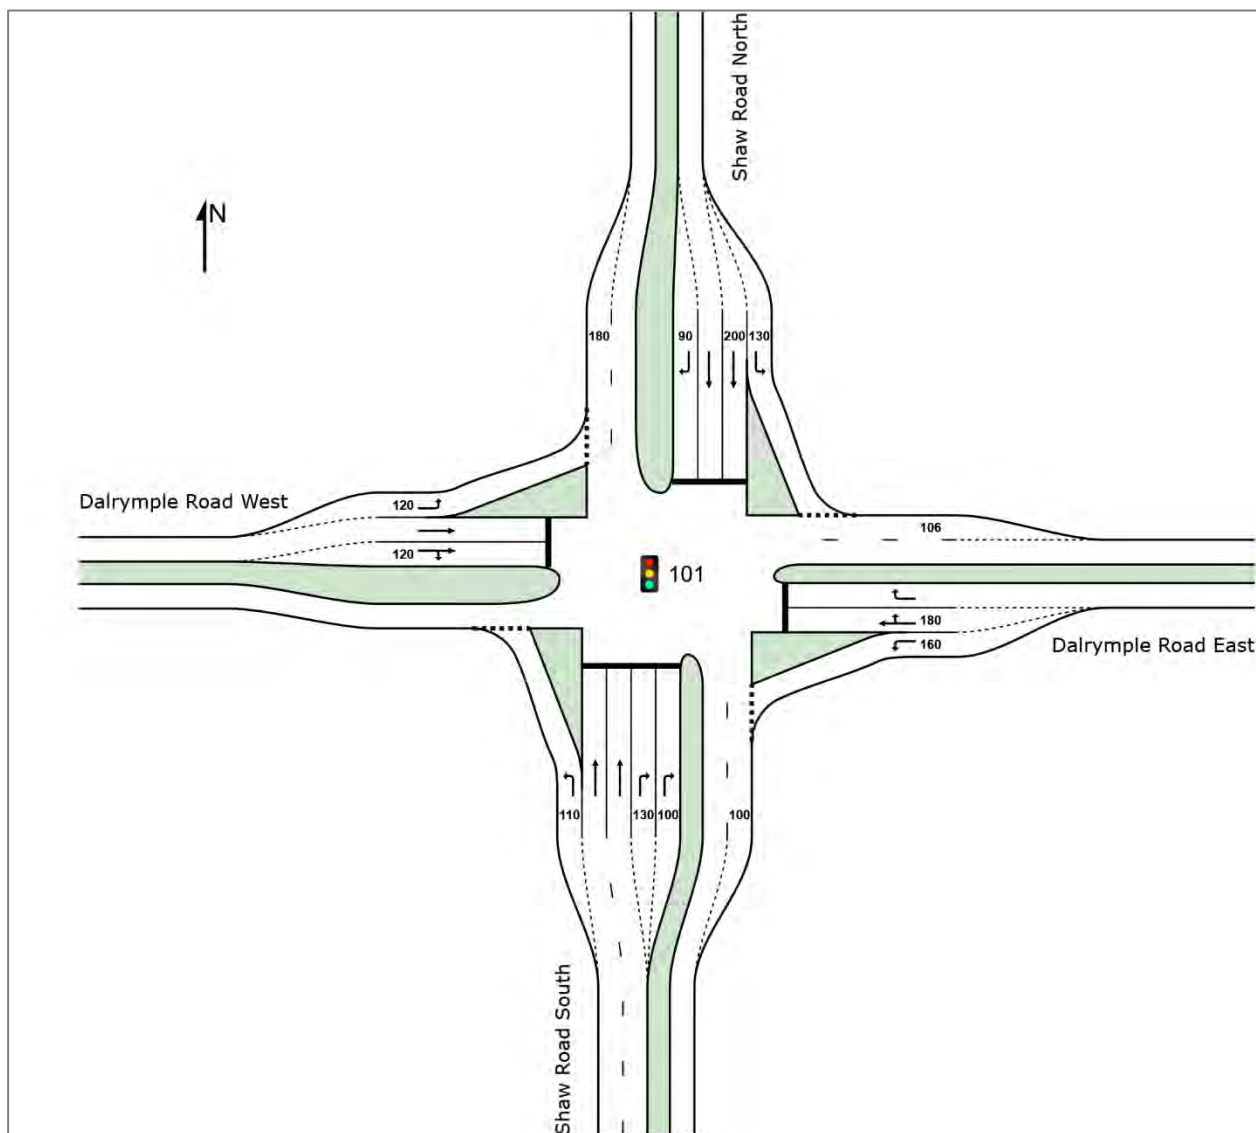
Dalrymple Road / Shaw Road SIDRA
